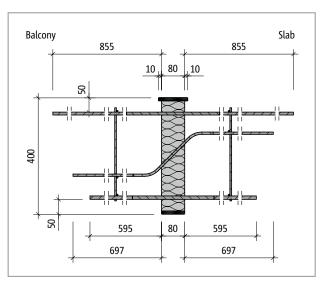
Schöck Isokorb® T type B-M1: Product section
